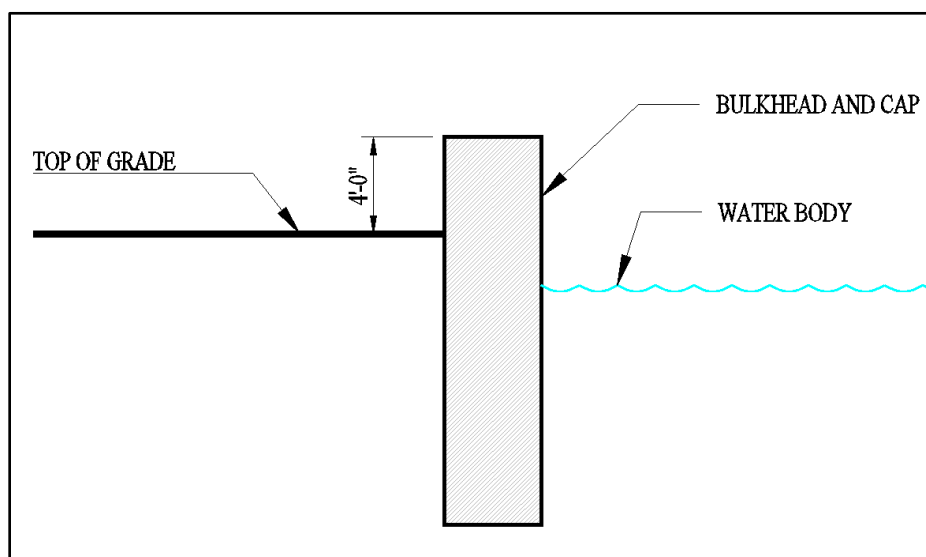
Floodwall Schematic Showing Bulkhead.
